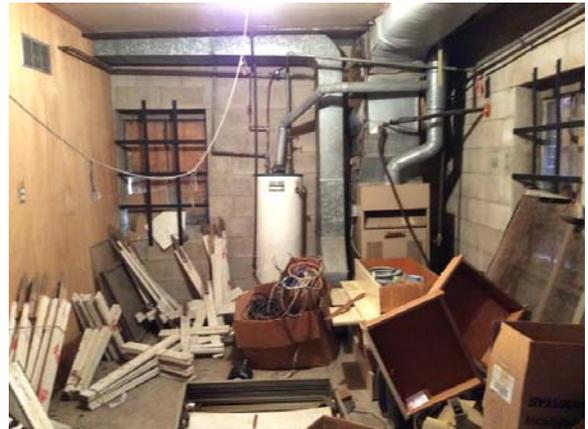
GARAGE UTILITY AND STORAGE AREA
